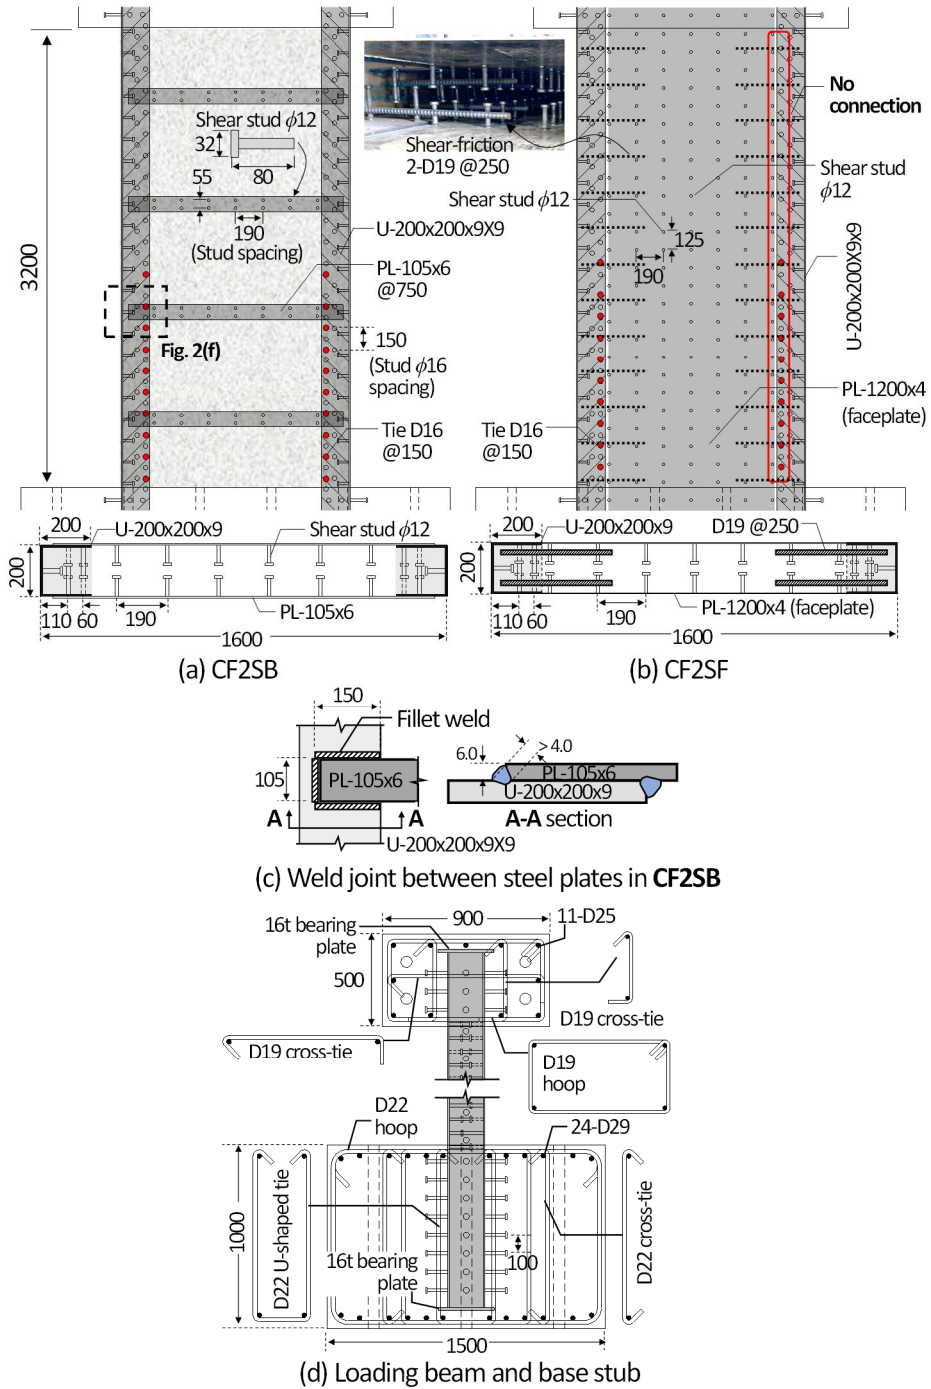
Details of flexural yielding specimens: (a) CF2SB; (b) CF2SF; (c) weld joint between steel plates in CF2SB; and (d) loading beam and base stub.
